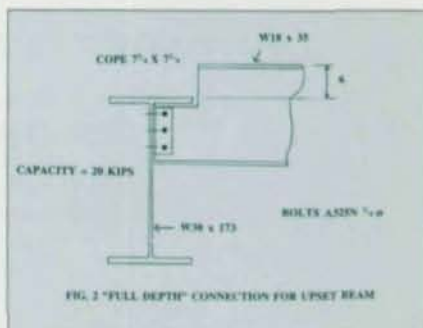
"FULL DEPTH" CONNECTION FOR UPSET BEAM
